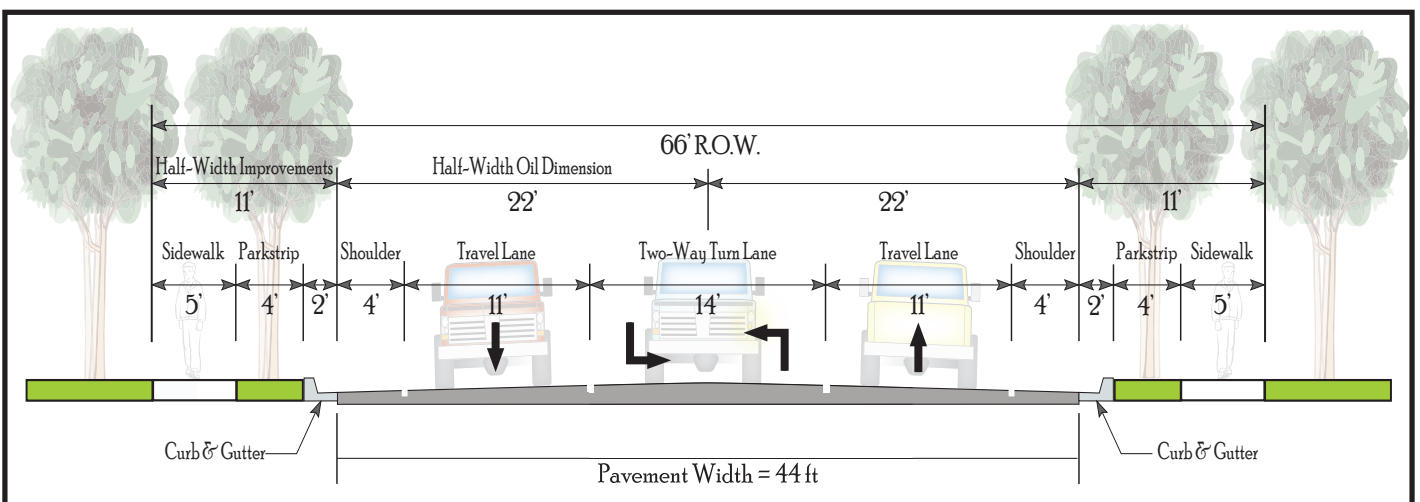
Three-lane Minor Residential Collector Street Cross-section
